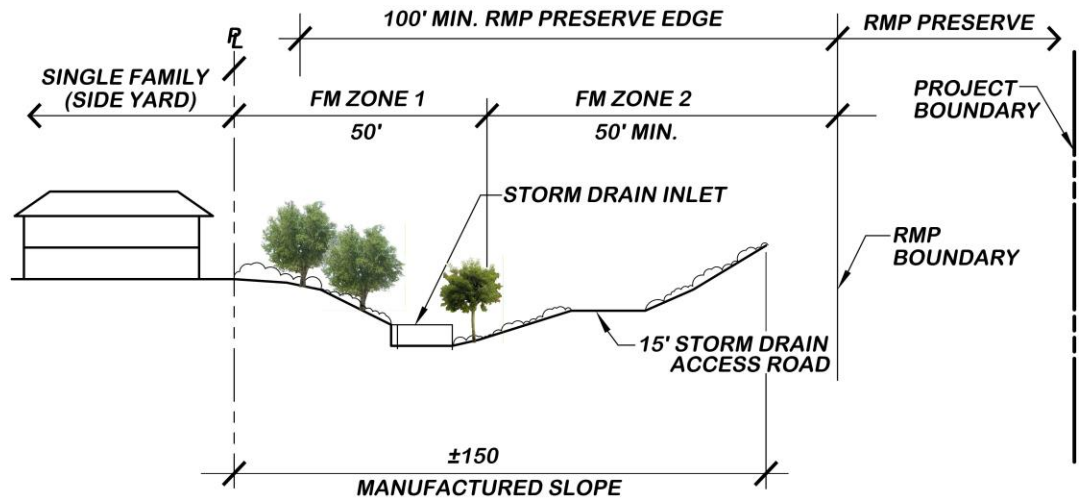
Typical Condition 7 – Perimeter Slope & Storm Drain Outlet at
